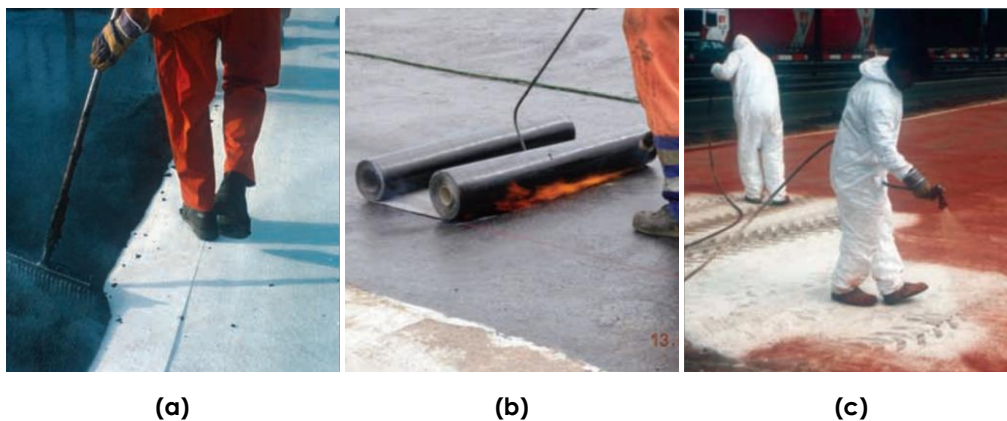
Different types of waterproofing layers used on the bridges in Wallonia : (a) Casted asphalt; (b) Bituminous sheet and (c) resin [30].
